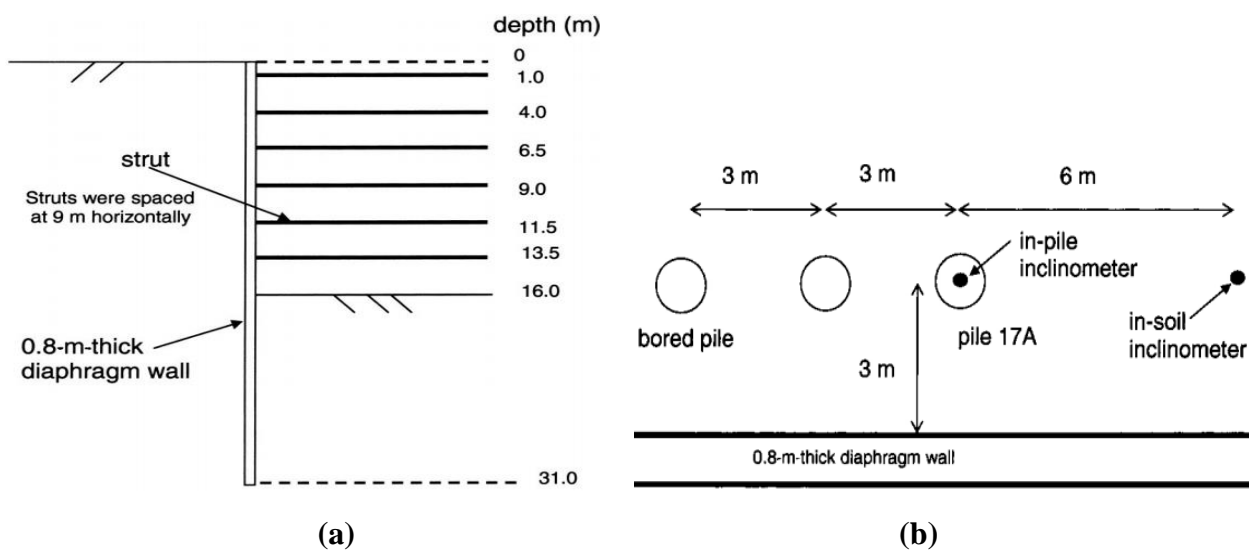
(a) Cross section of excavation (b) positions of piles and inclinometers (Goh et al. 2003)
